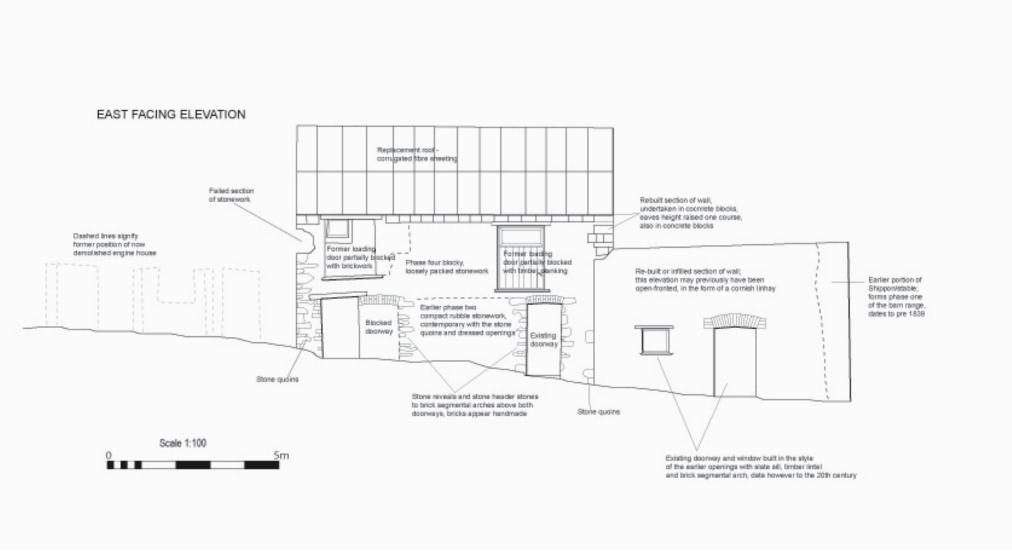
The east elevations of the granary and the shippon/stable, scale 1:100.
